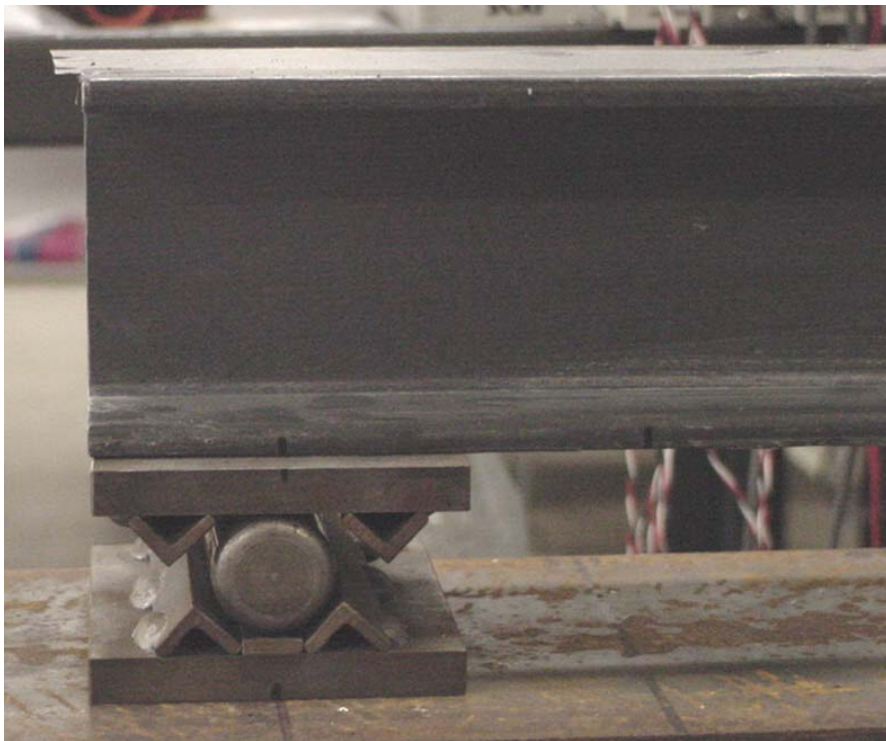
Steel end support roller with top plate utilized for four-point bend setup
